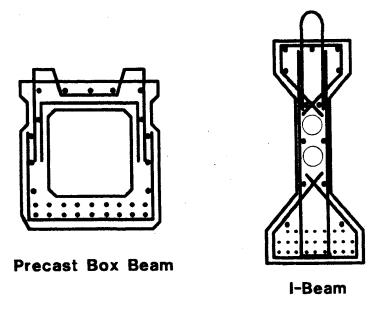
Reinforcement in Precast Box Beams and I-Beams
